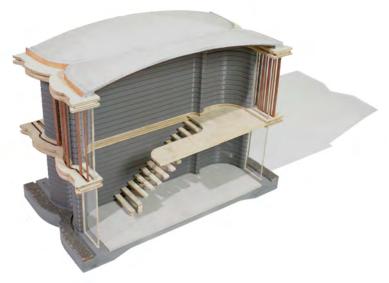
Dividing Wall Sectional Presentation Model - Iso, 1:25.
